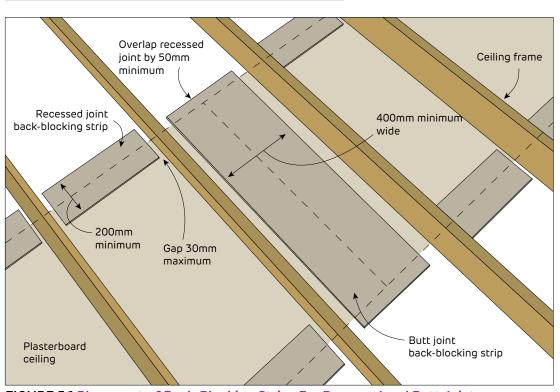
Placement of Back-Blocking Strips For Recessed and Butt Joints
